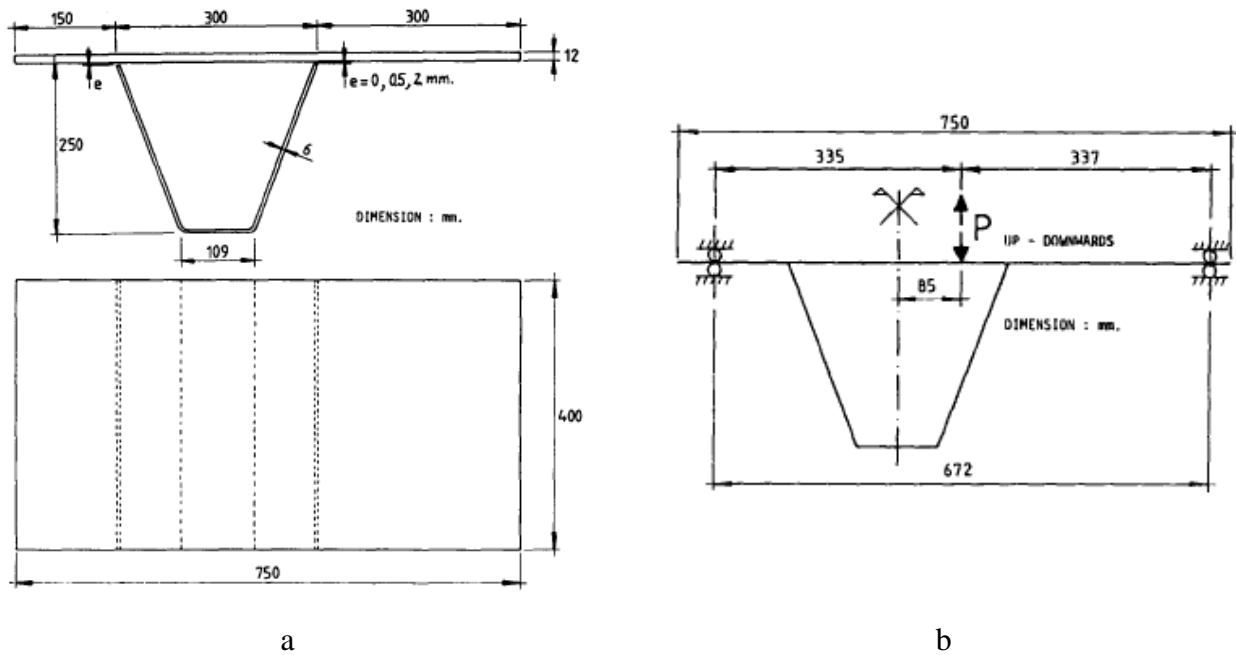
a). Dimension of the fatigue test specimen. b). Fatigue test setup^[5]
